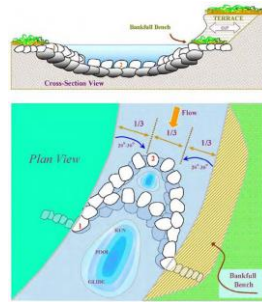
E – Boulder Cross Vane and Constructed Bankfill Bench
